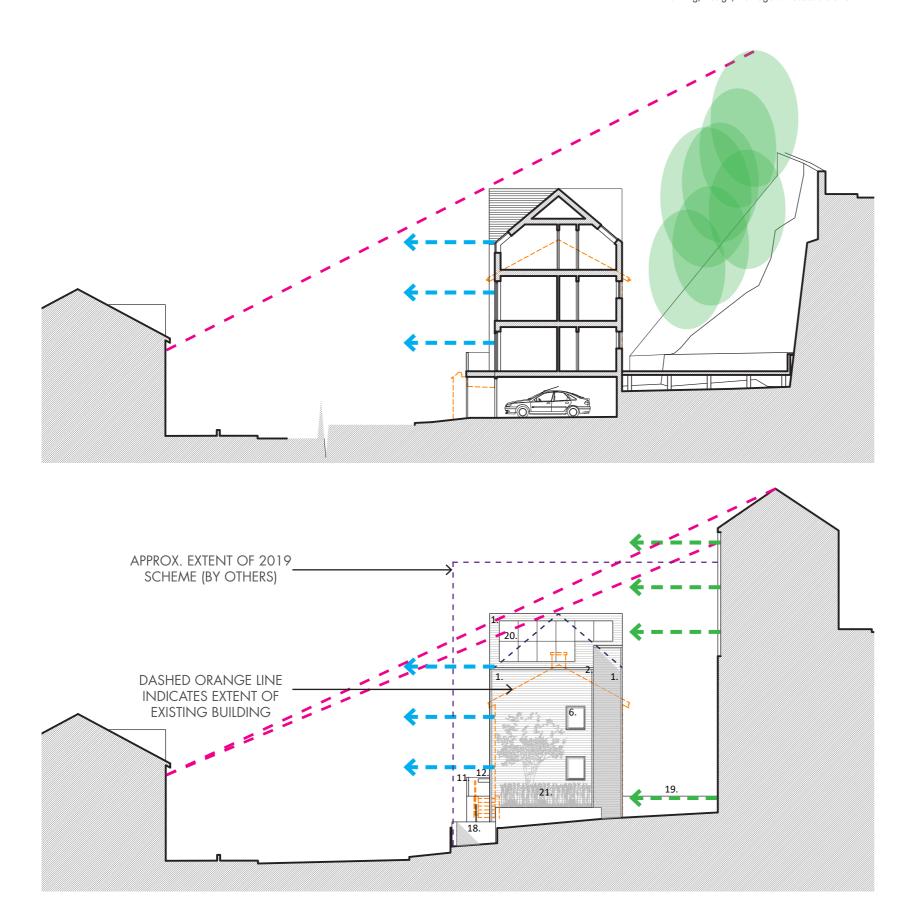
(upper): Street and building section showing the proposed extended building lower than the tree-line when viewed from the upper floor of No.23
